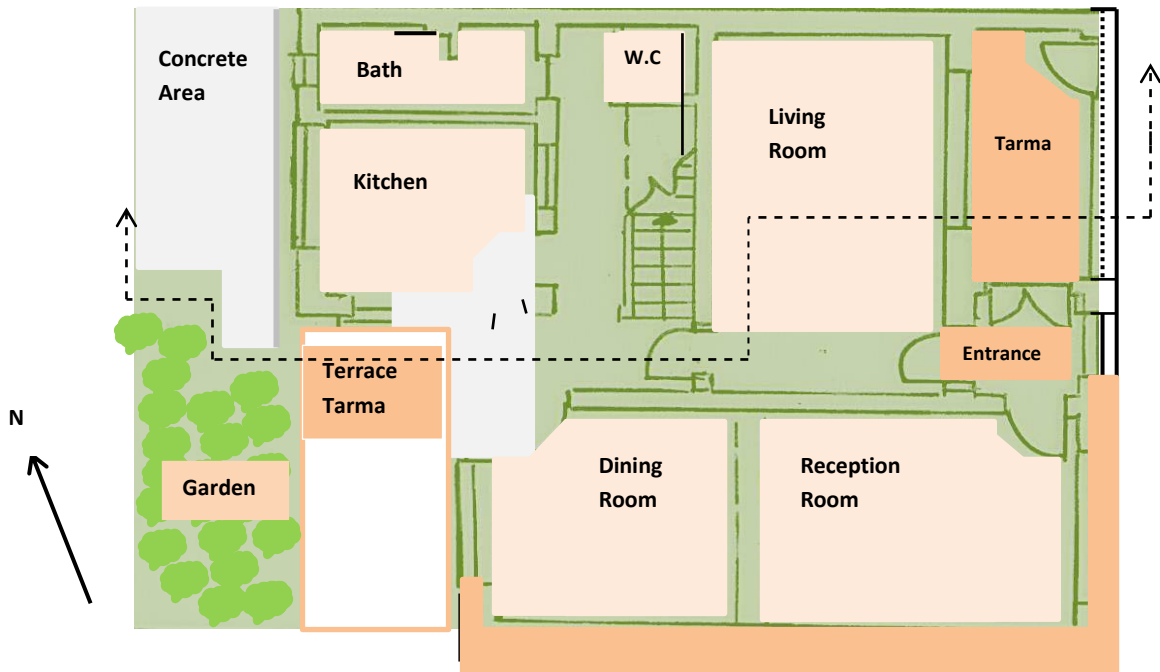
Ground floor level plan of the selected modern house. Scale: 1:100
